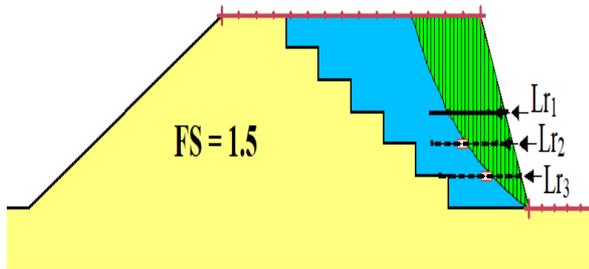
Slope with Reinforcement Provided at Bottom Half of Embankment to maintain FS of 1.5
